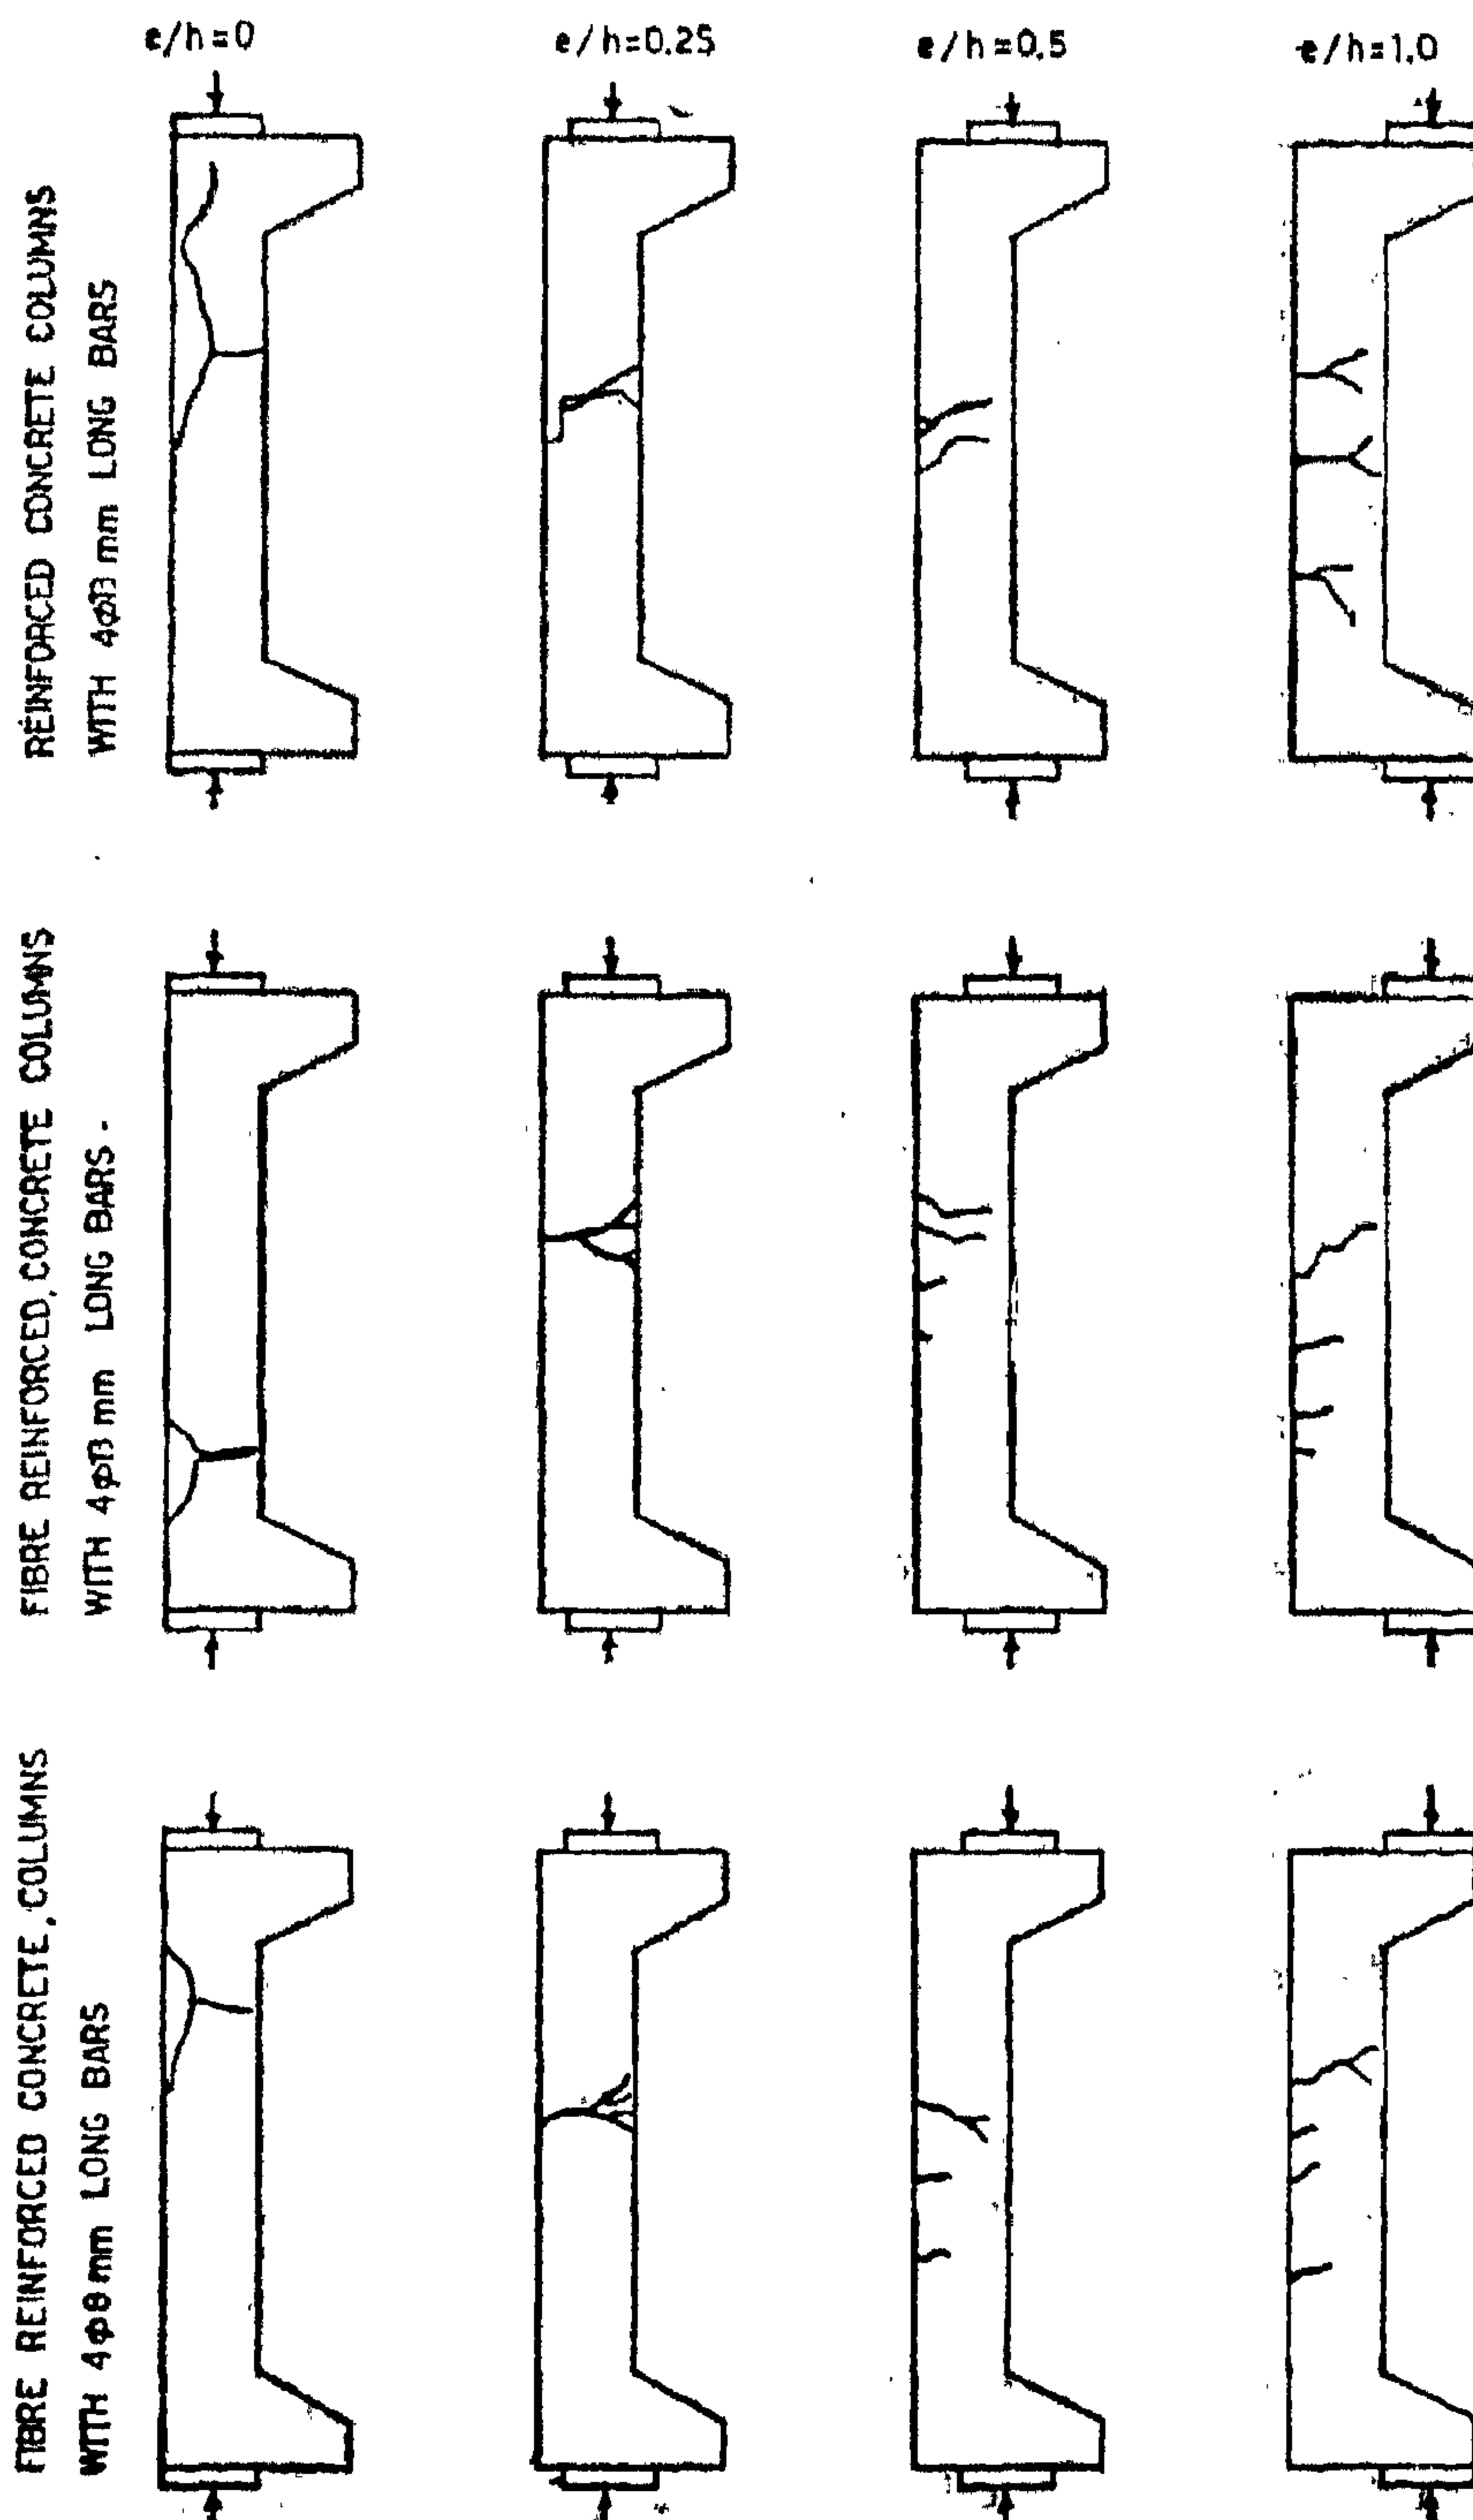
CRACK PATTERN OF TESTED COLUMNS.
